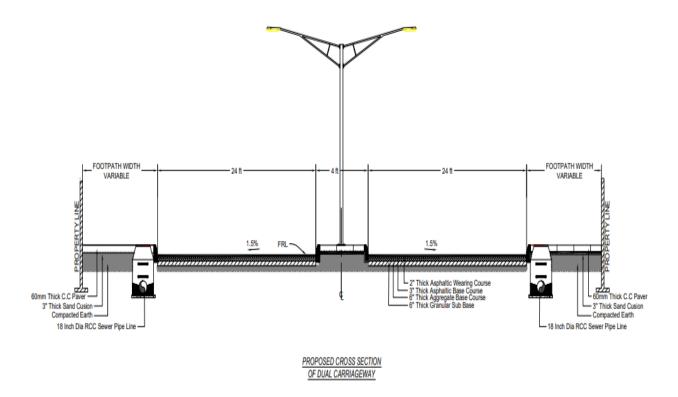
24' Wide Road (Dual Carriageway) Cross section
